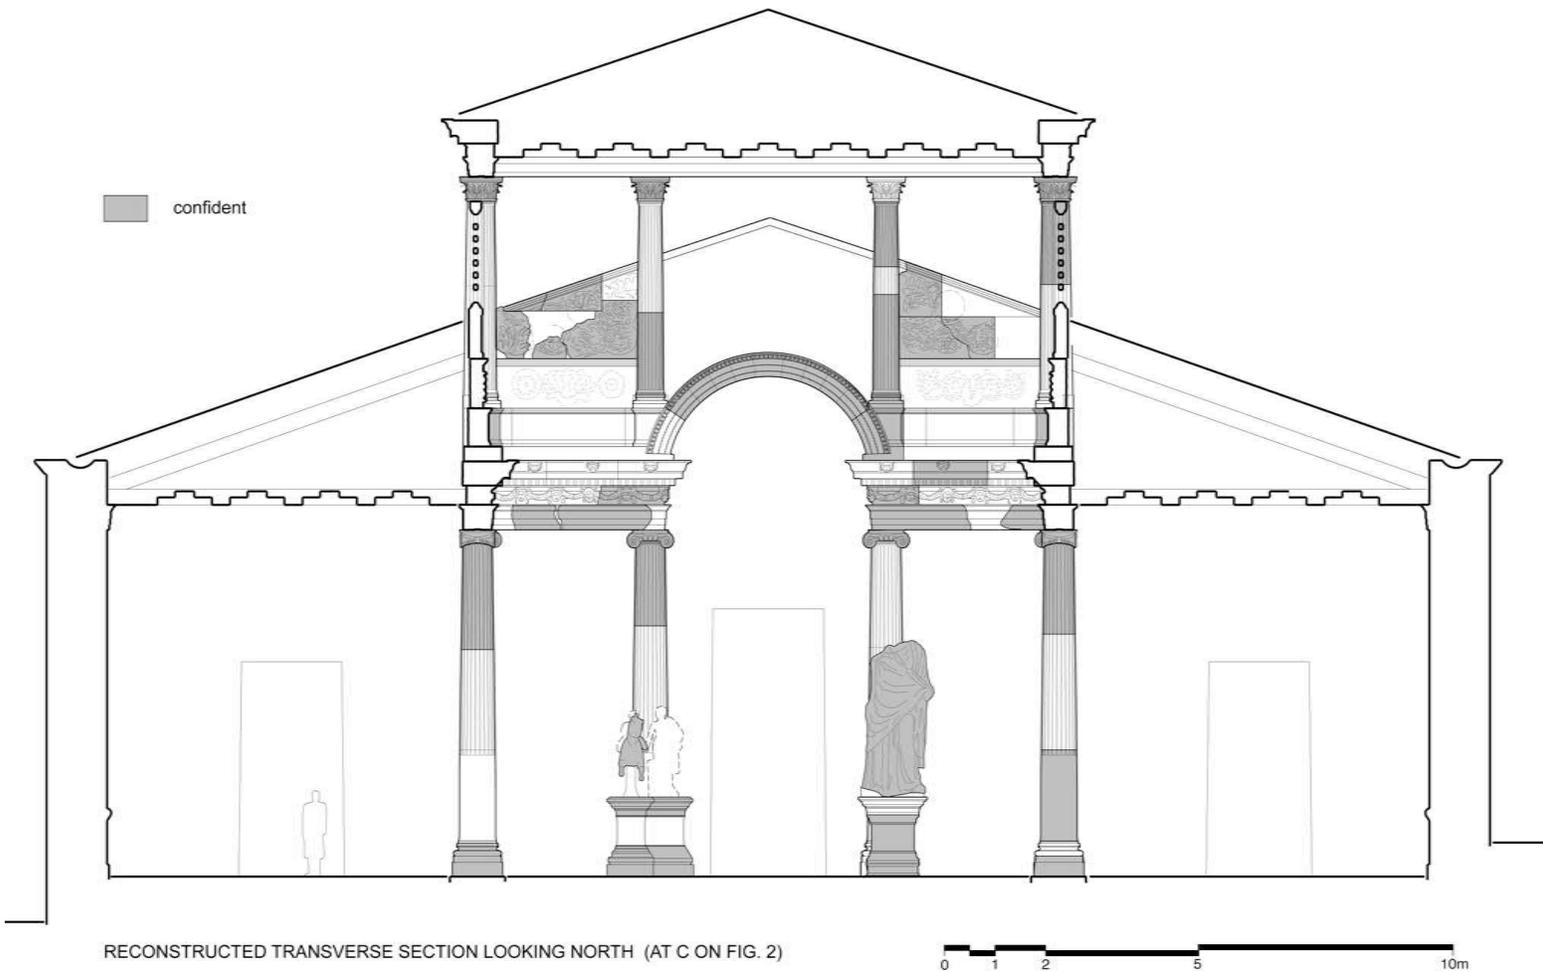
Reconstructed transverse building section looking north towards South Agora, showing extant architectural blocks (P. Stinson).
